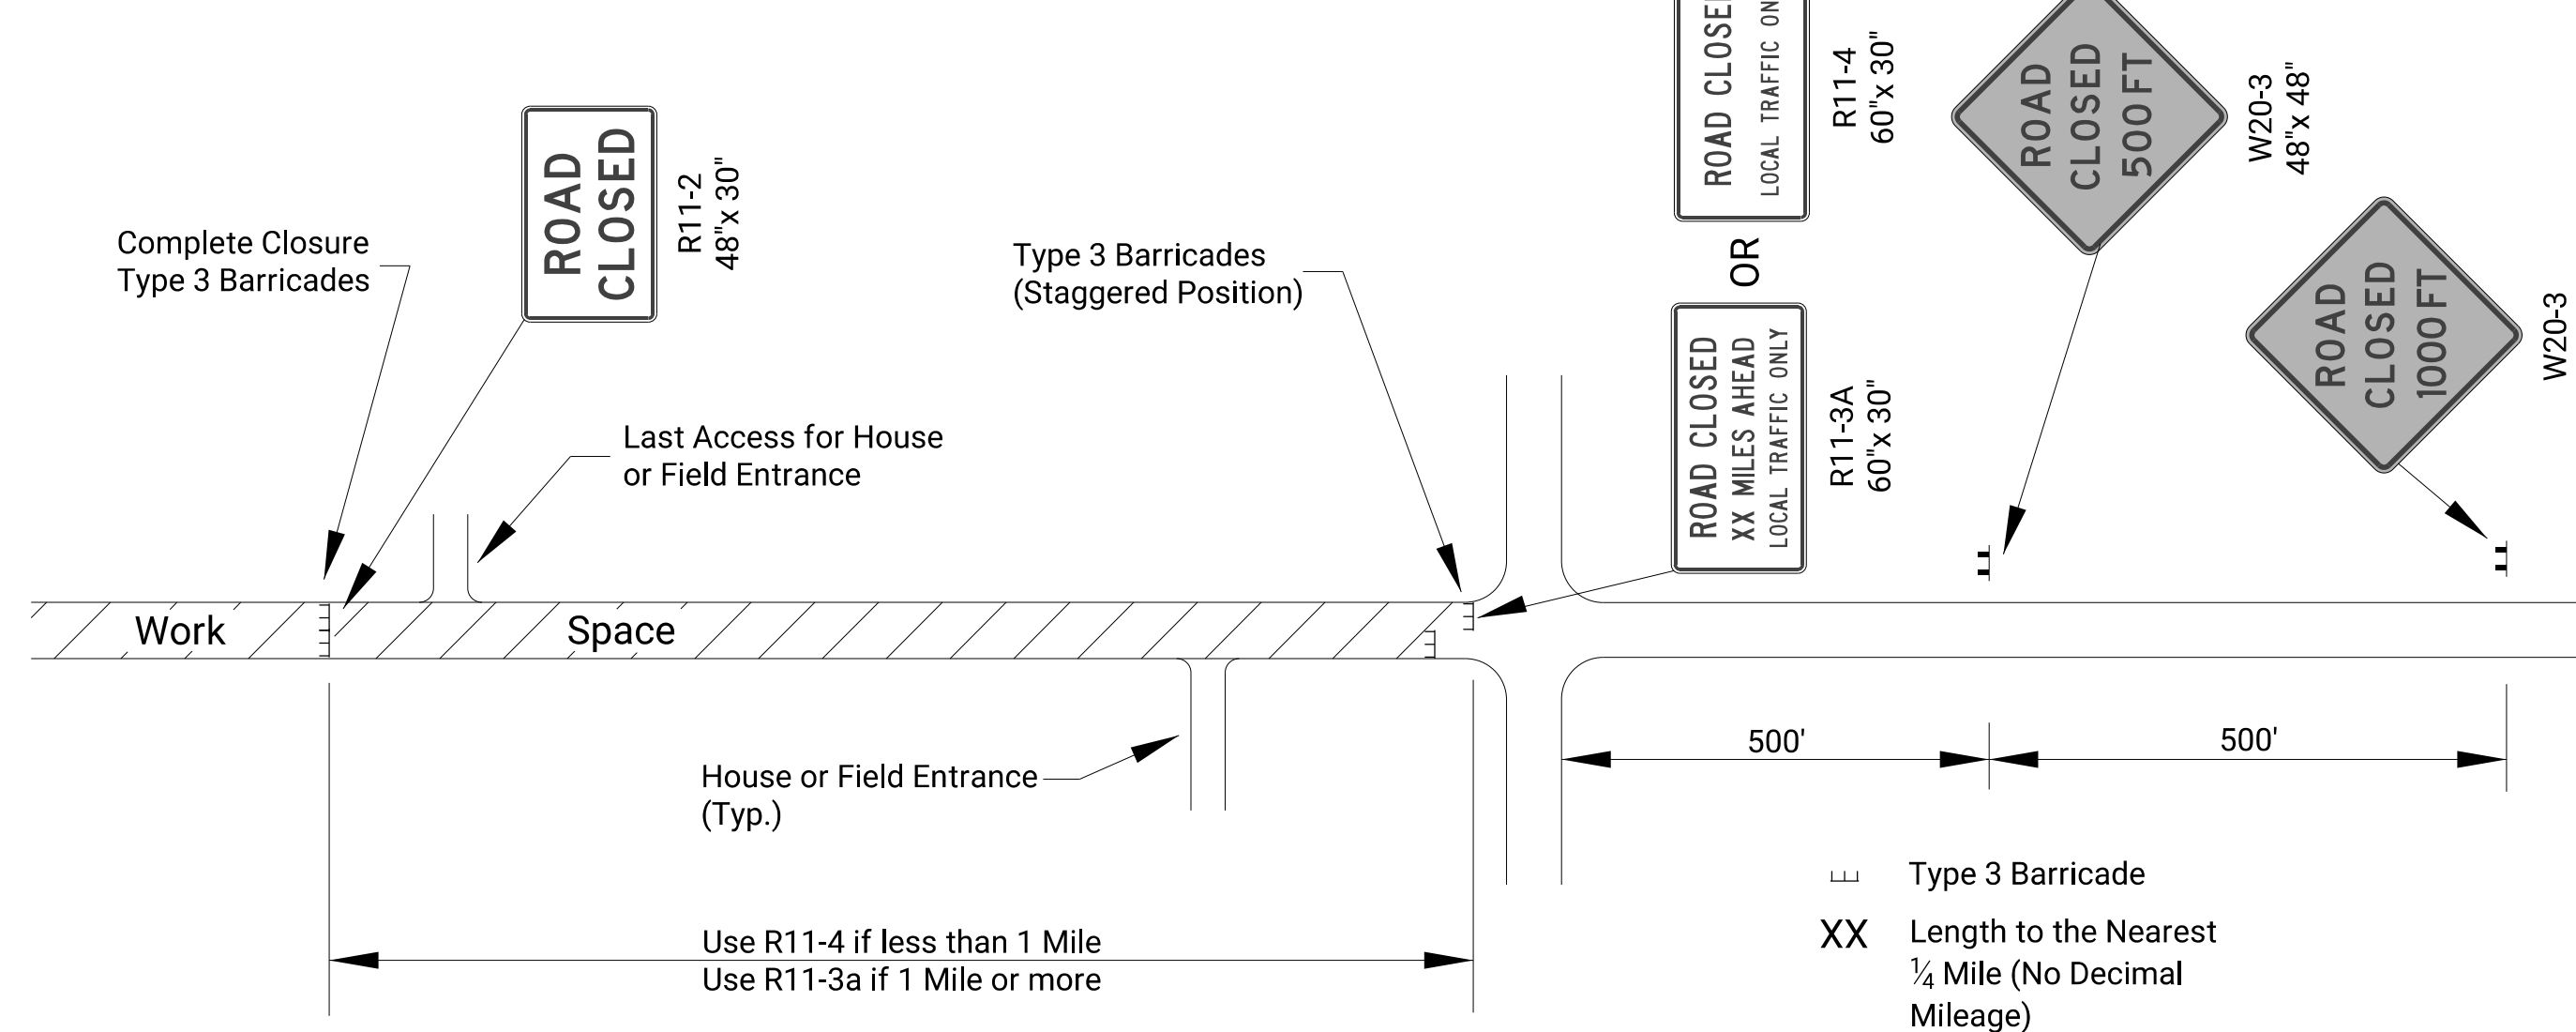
TYPICAL SIGNING FOR ROAD CLOSURE - LOCAL TRAFFIC ACCESS
